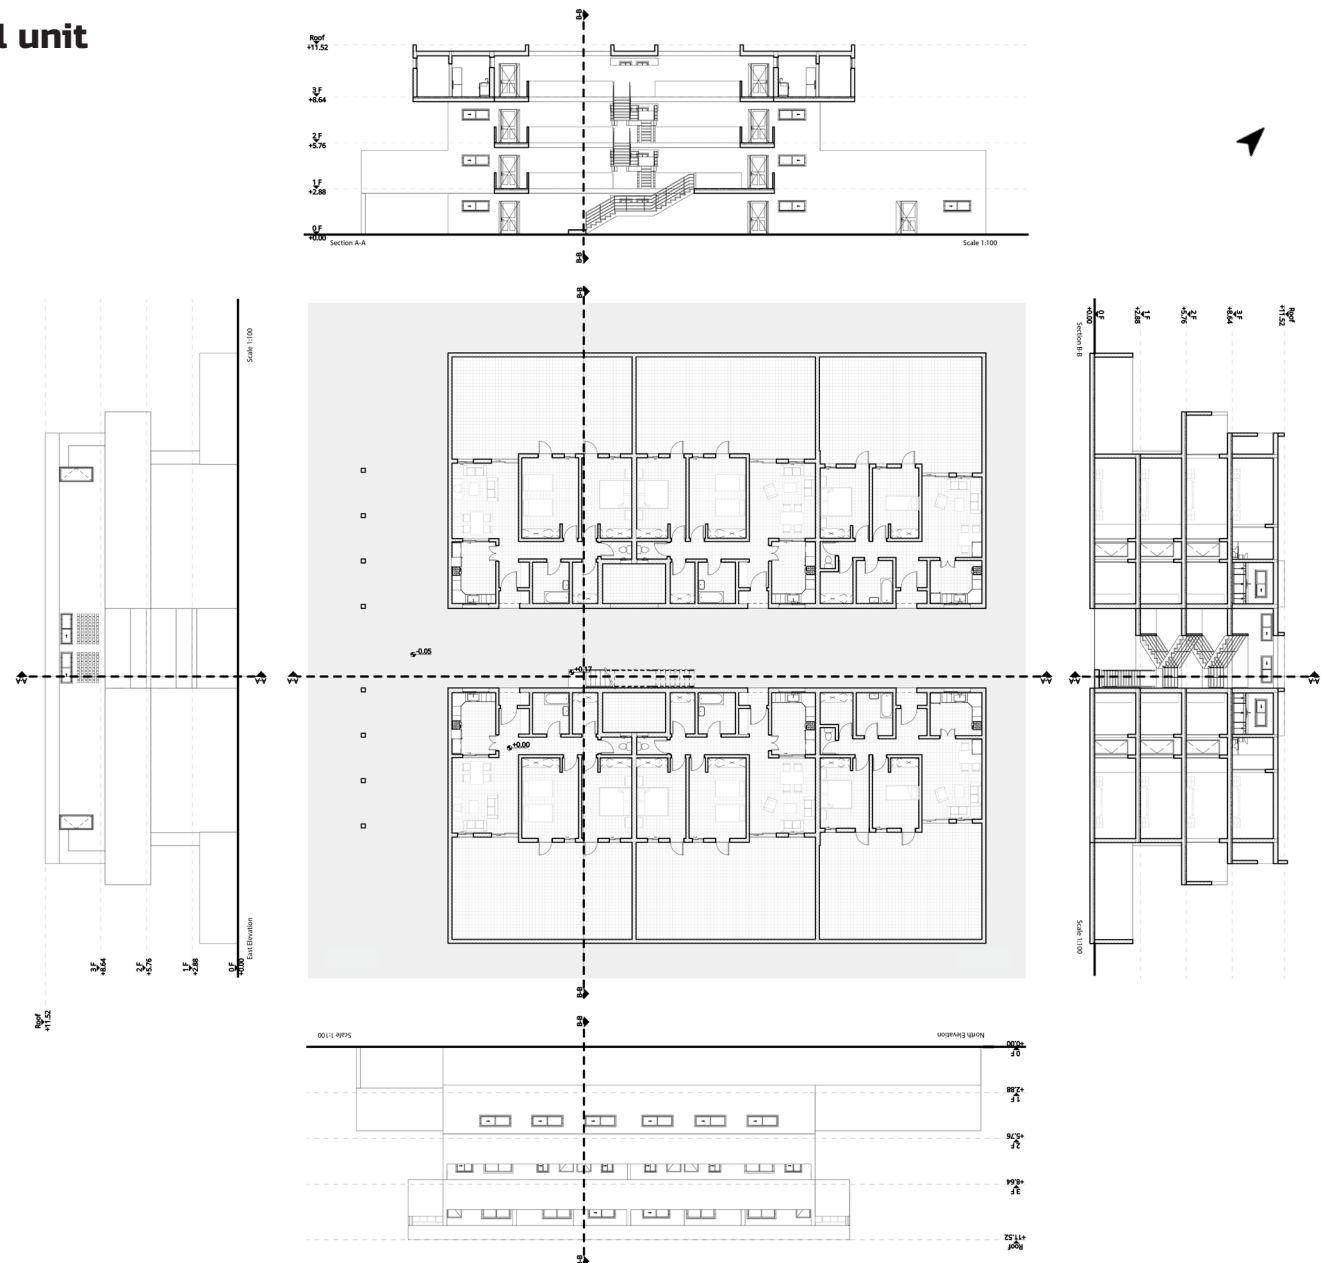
Original 1964 Patio unit, Ground Floor plan, two sections & two facades, Out of scale. *Source: elaborated by the author.
